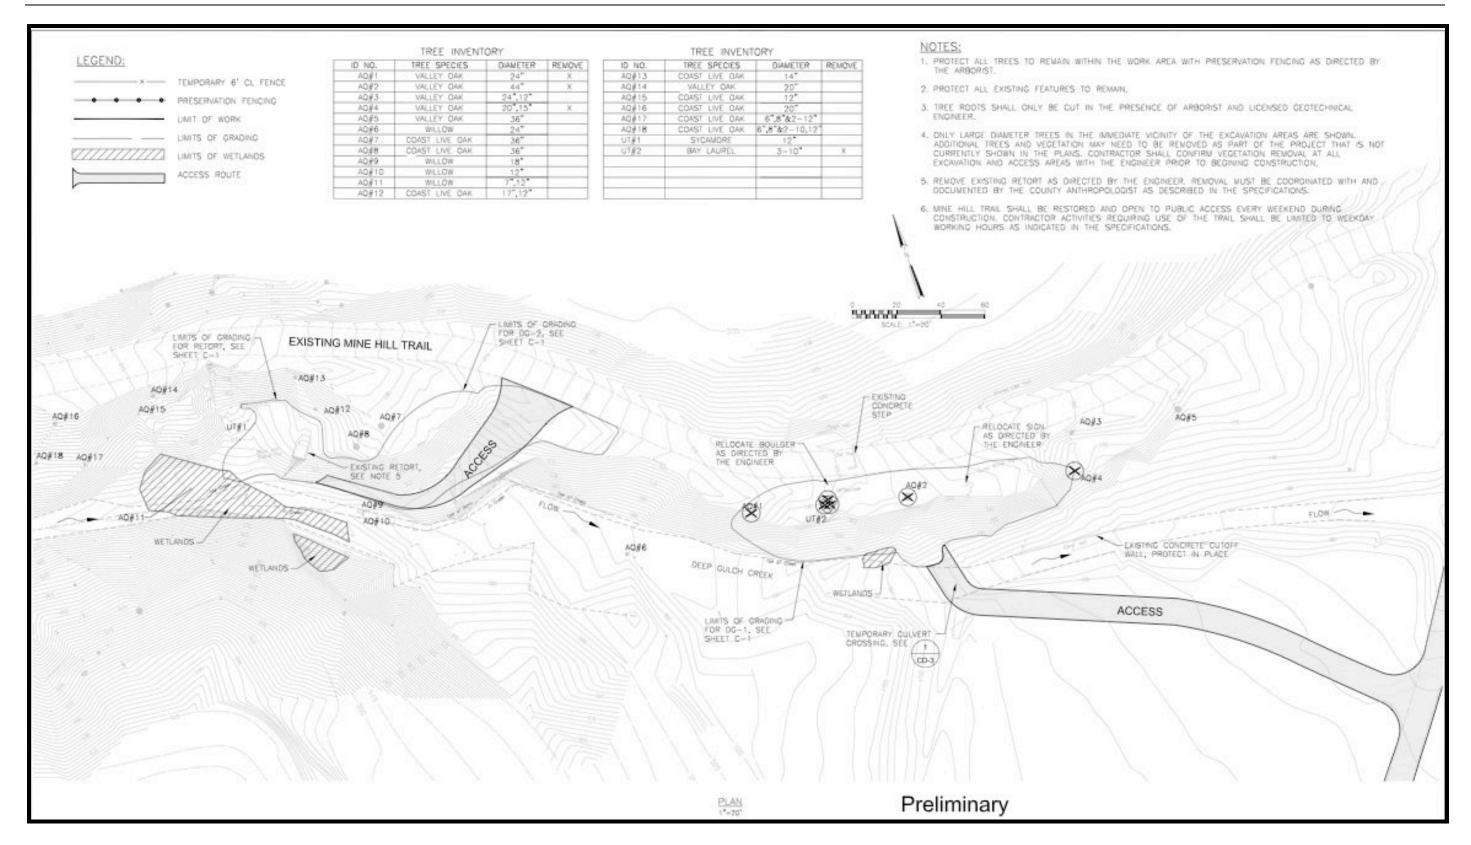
Tree Removal Plan - Deep Gulch (Courtesy of CH2M Hill)
